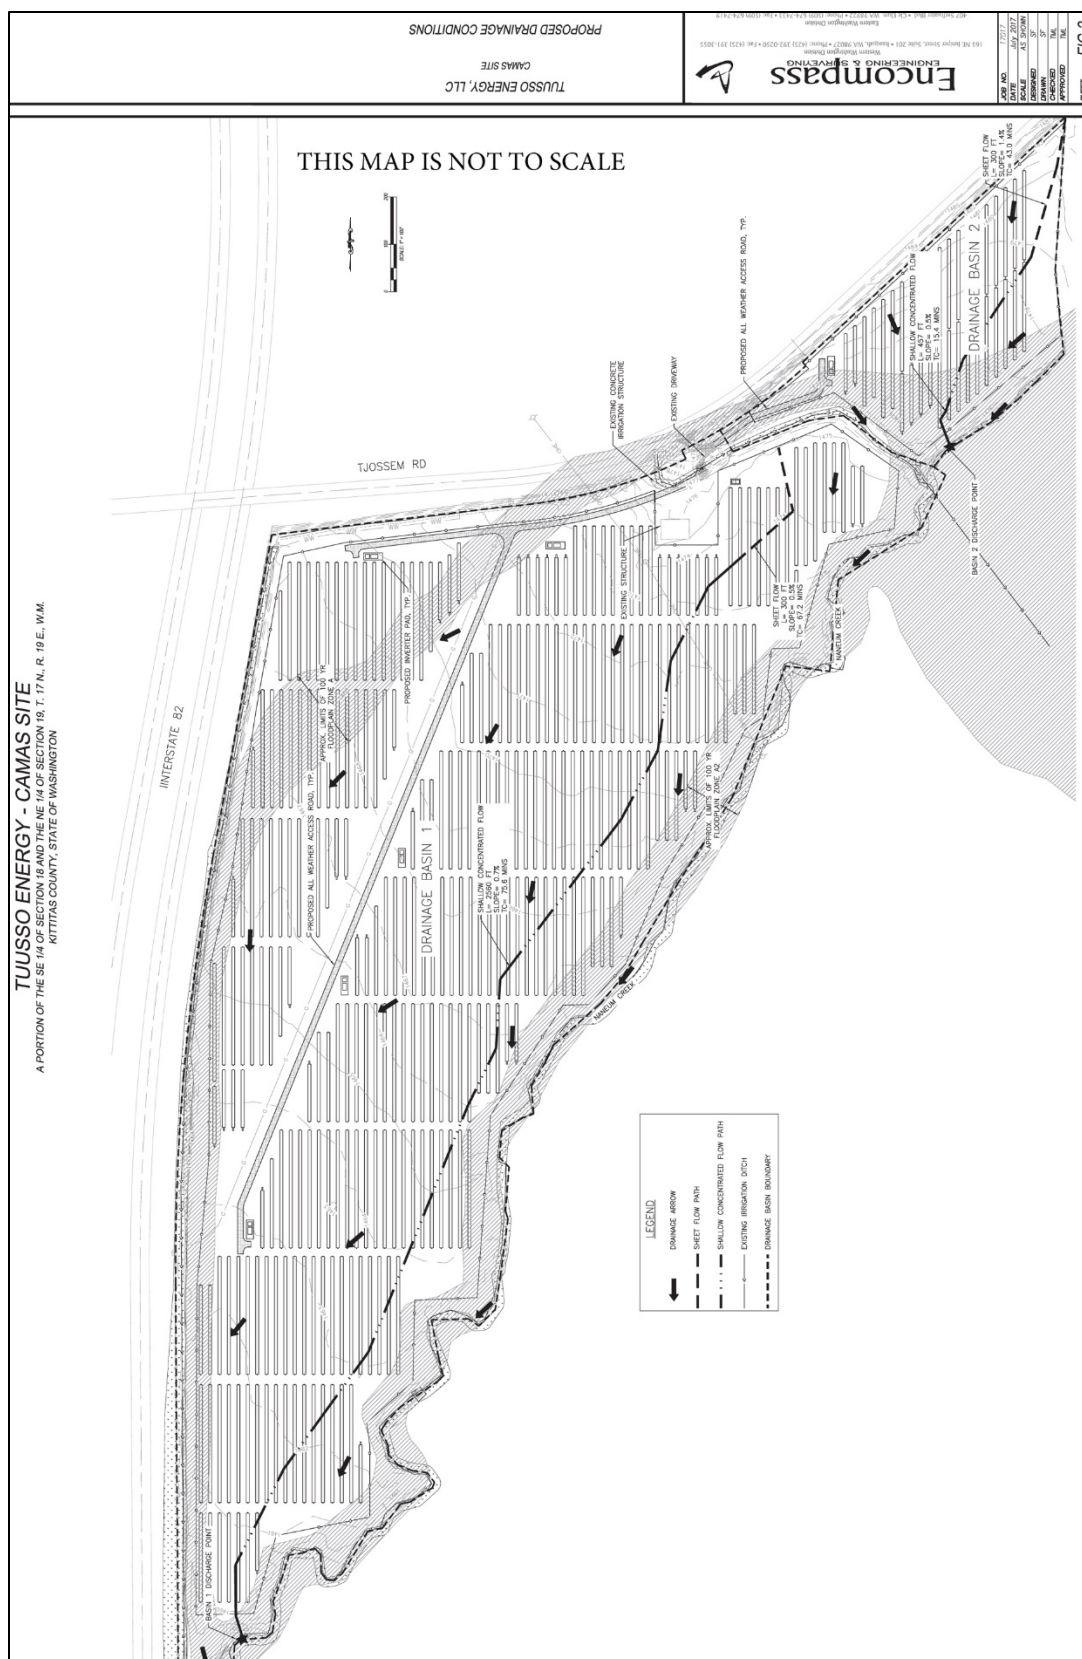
Proposed drainage conditions for the Camas Solar Project site.
